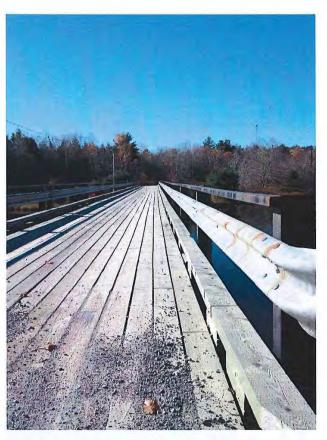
LOOKING E ALONG S RAIL, TYPICAL
